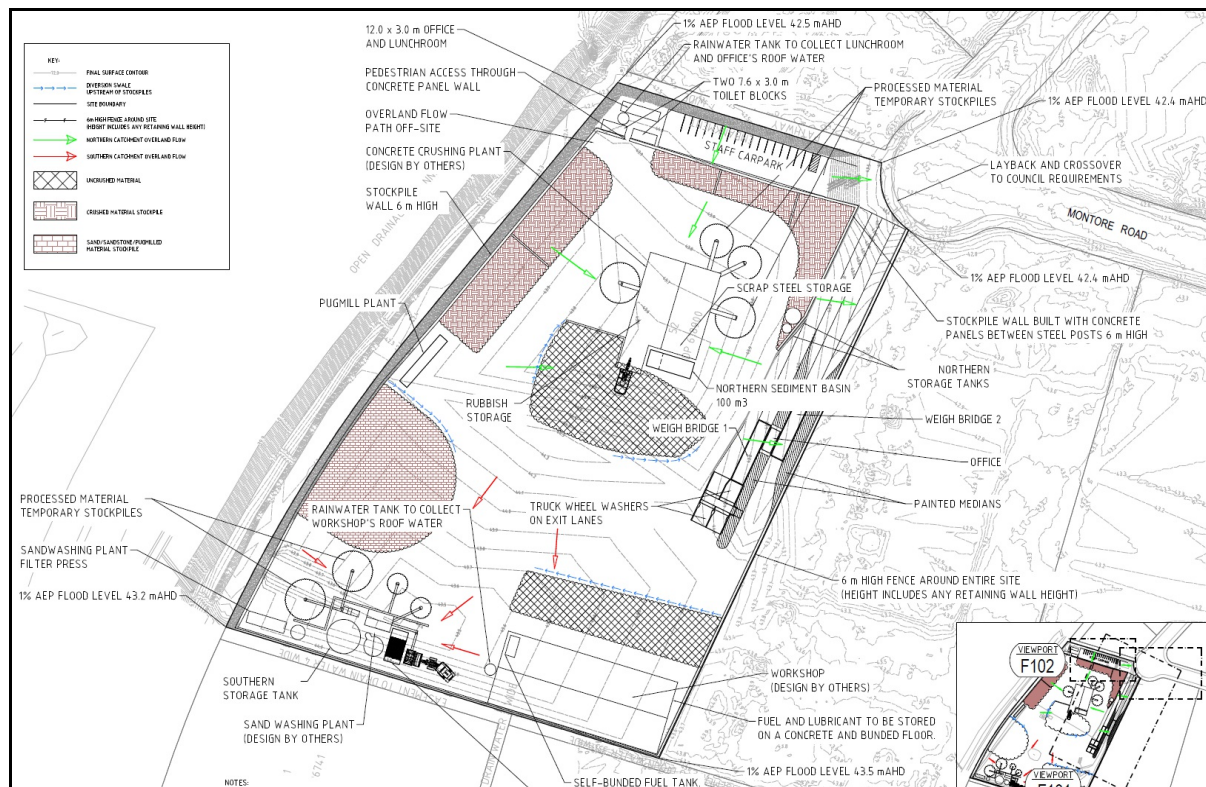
Extract from the Site layout plan (refer to Appendix 4 for plans and flow diagrams).
